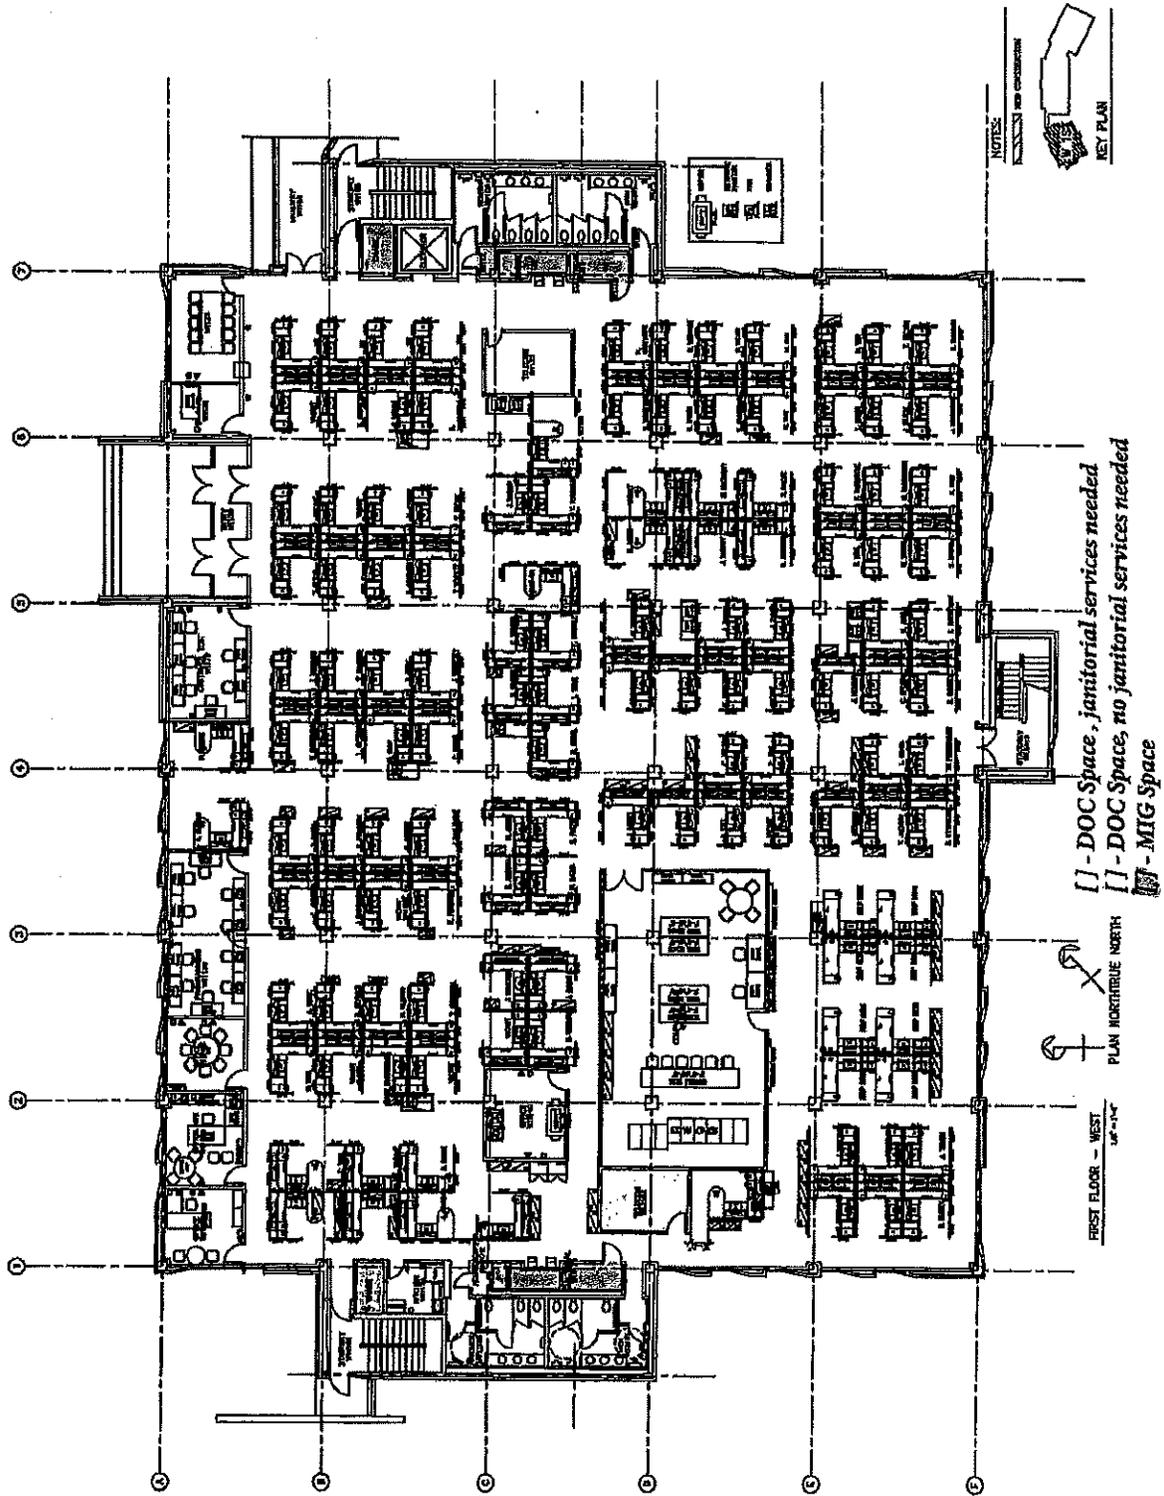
EXHIBIT B - FLOOR PLAN & JANITORIAL SCOPE
